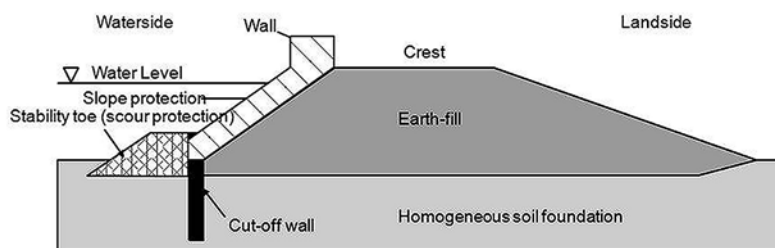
Composite levee with slope protection, cut-off, stability toe
